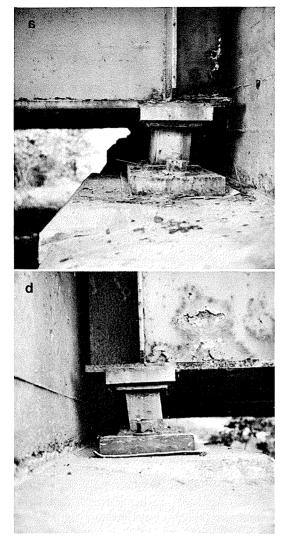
Inclination of bridge bearings due to horizontal movements of the abutments. (a) Tilted bearing at southwest corner of bridge. (b) Tilted bearing at northwest corner of bridge.
